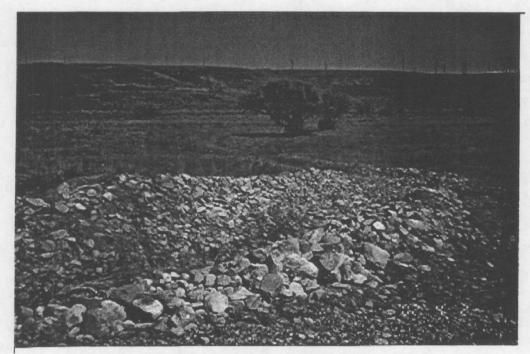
, SD No. 2E, Drainage Ditches Leaving Impound Area
